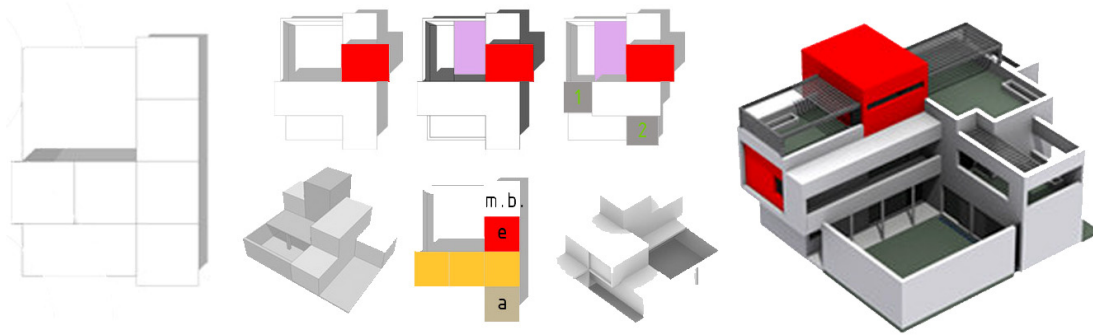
Design of a house; from plan layout to detailed three dimensional model (Özkaraduman, 2008)
